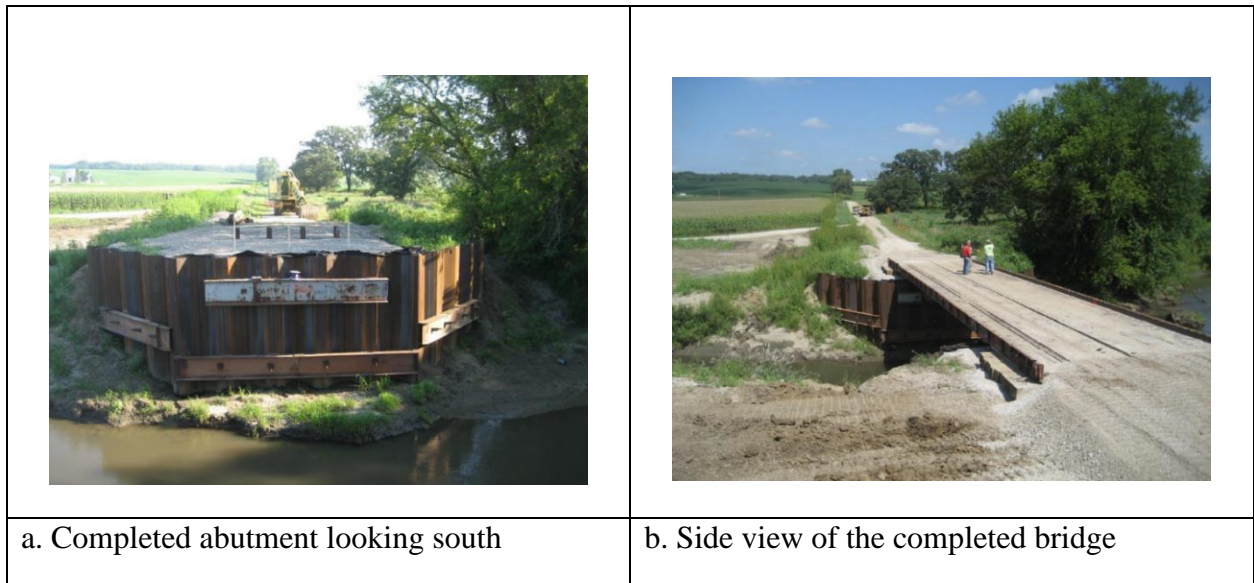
Tama County bridge resting on sheet pile walls (Evans et al., 2012)
